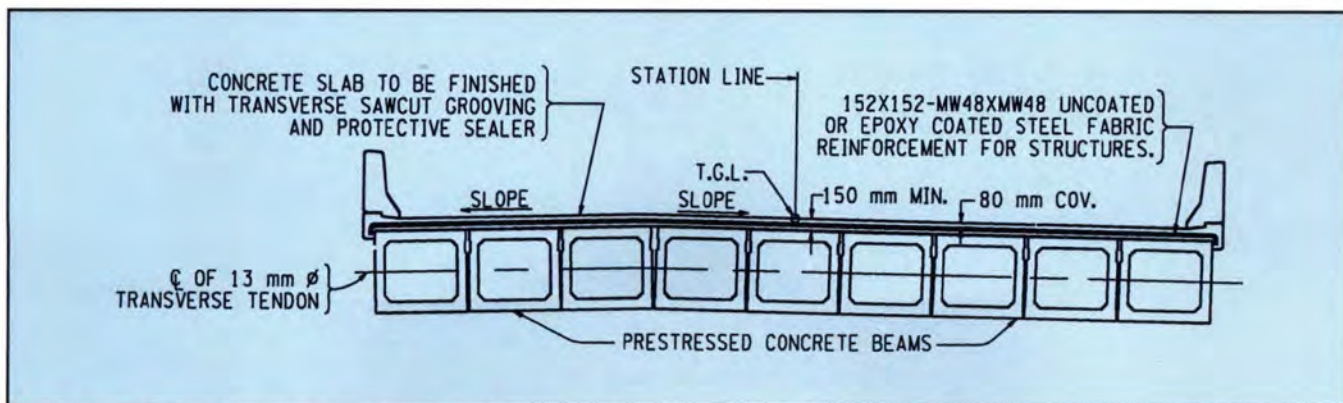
Typical transverse section of an adjacent box beam bridge.
